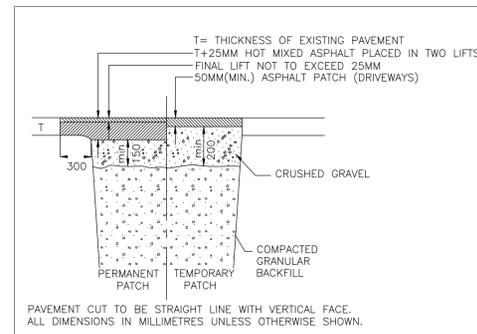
LANEWAY TIE-IN (1100 BLK)
